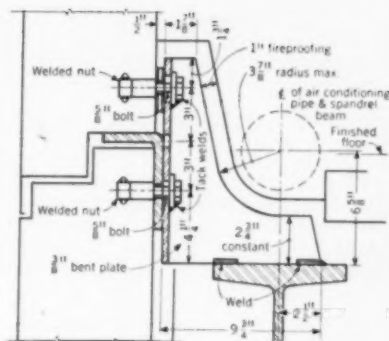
Typical steel-faced wall panel is fastened in place with welded brackets and bolts.
